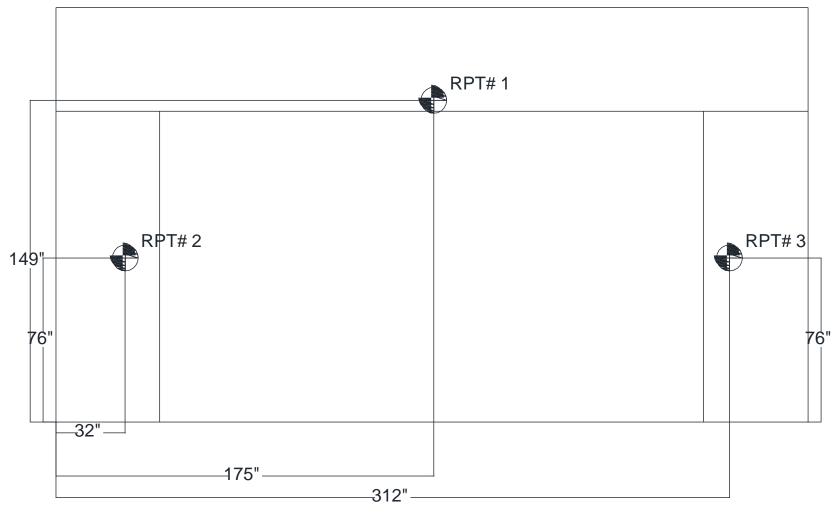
Test #3 Transducer Location – 4psi Chamber
